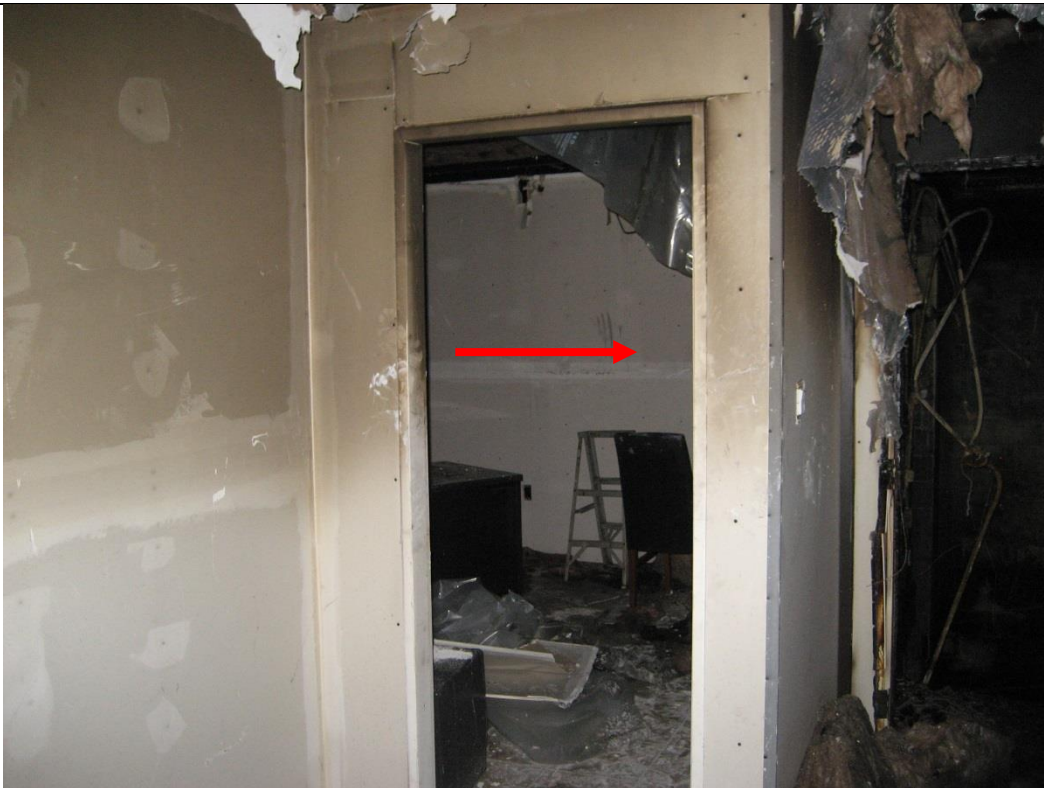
| Date: February 2014 | Location: Zone 1 – Second Floor, northwest room, east wall
